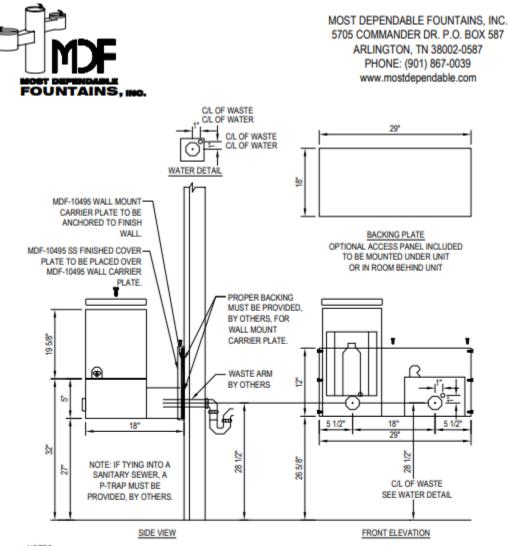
Wall-Mounted Drinking Fountain and Bottle Filler
